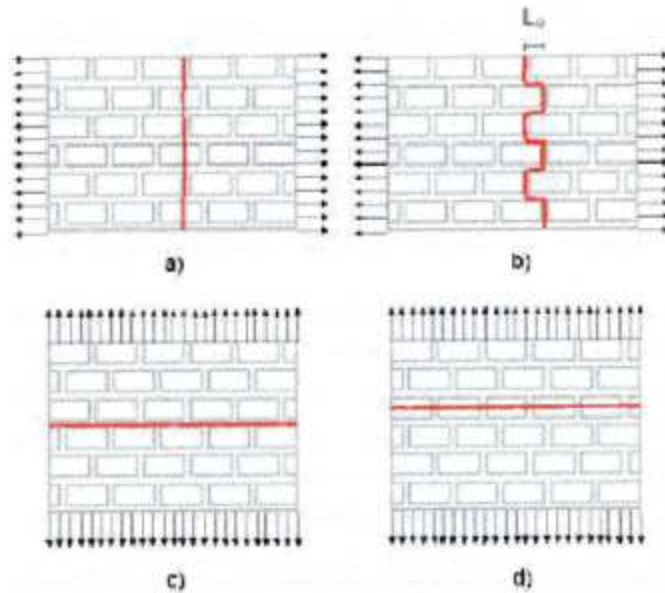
Failure modes of masonry subject to direct tension
